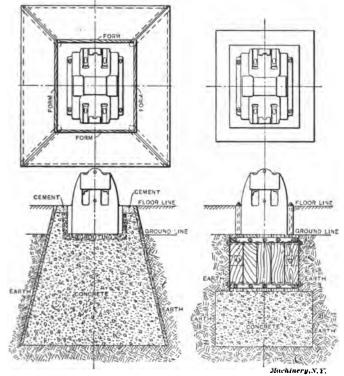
Concrete Foundations for Drop-hammers in the Pratt & Whitney Co.'s Blacksmith Shop
